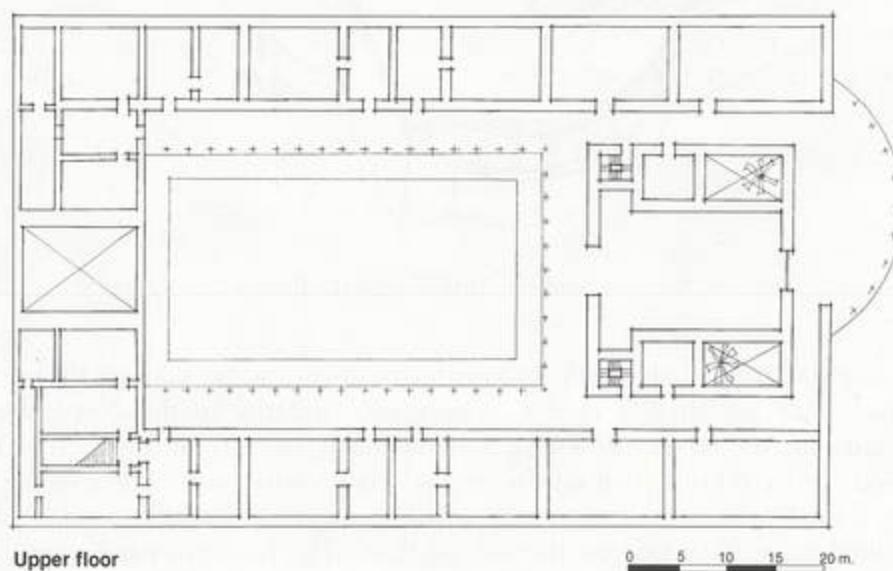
Reconstructed plan of the Promontory Palace, upper floor
